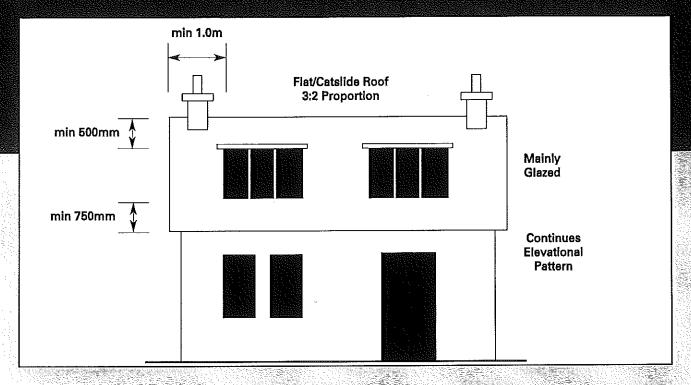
BOX DORMERS - Dimensional/elevational constraints where applicable
